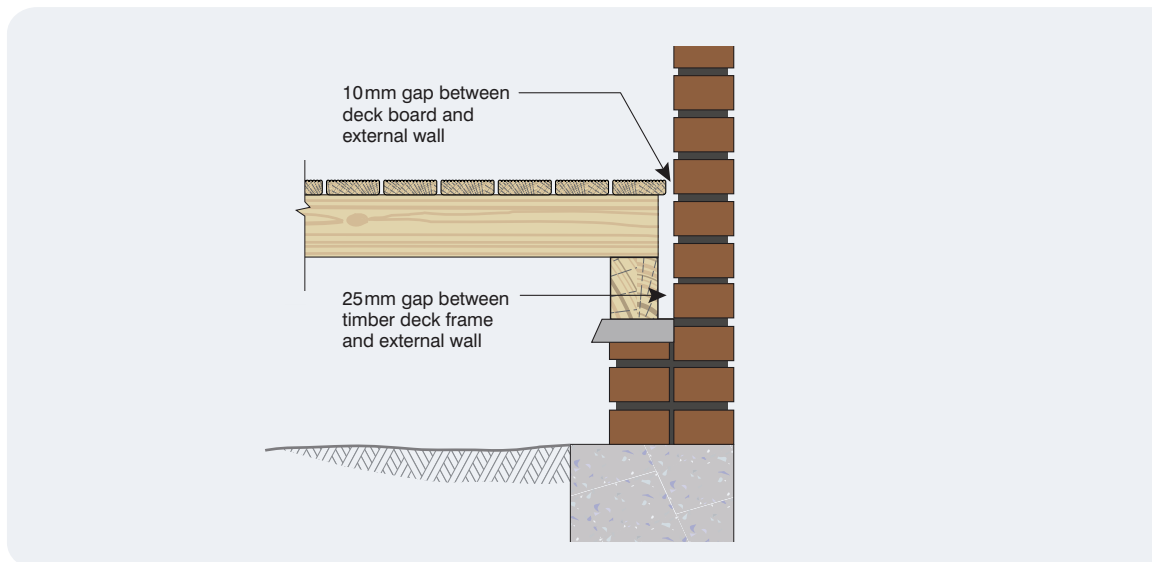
Illustration of a 25 mm gap between timber deck-frame work and brick external wall.
